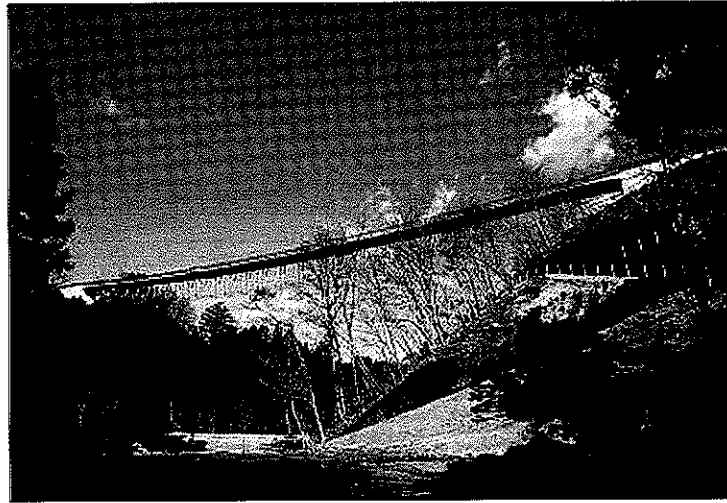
Completed MORINO-WAKUWAKU Bridge
